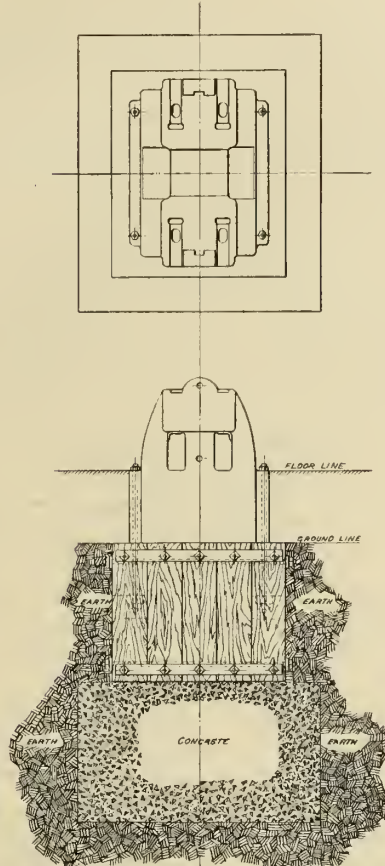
Plan and Sectional Elevation of a Drop Hammer Foundation with Wood Cushion.
